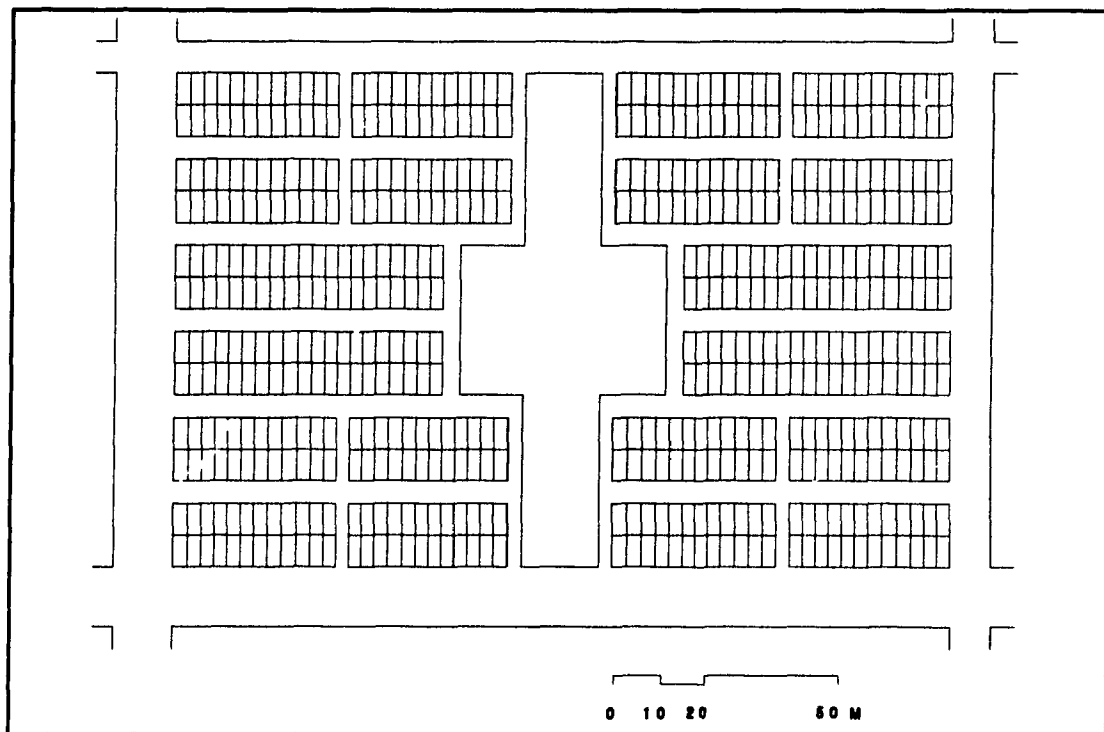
PLOT LAYOUT - CONTROL PLAN
